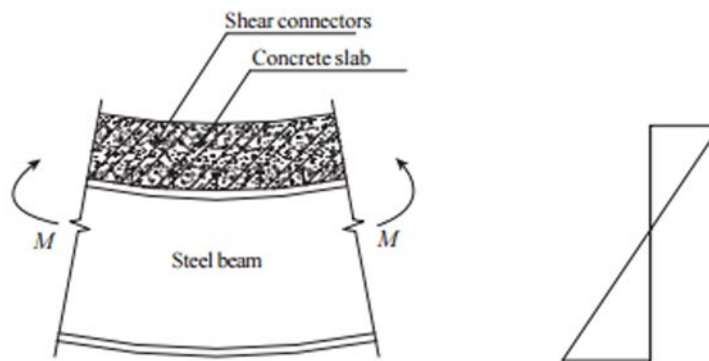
Beam with full composite action: (left) force and deformation of steel beam and concrete slab; (right) stress distribution along section height (Li *et al.* 2007).
